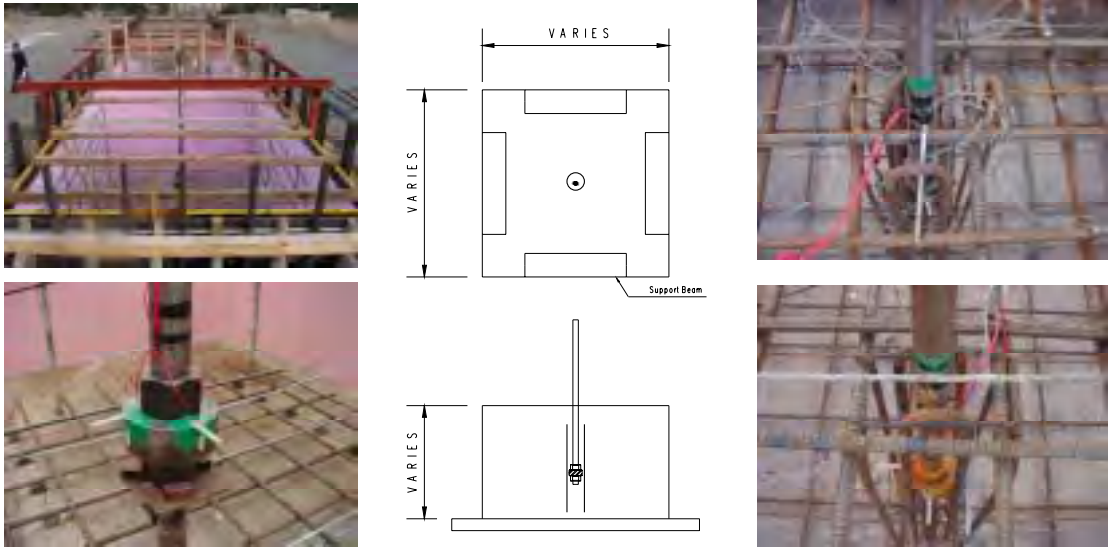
Schematic Sketch and Photo of Tension Test Specimens (T1, T2, T3, T4 and T5)
